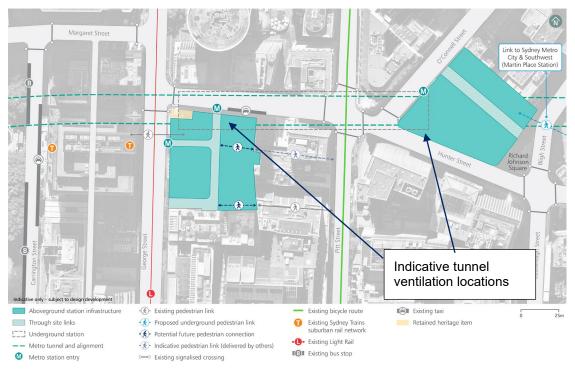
Hunter Street (Sydney CBD) Station indicative layout
